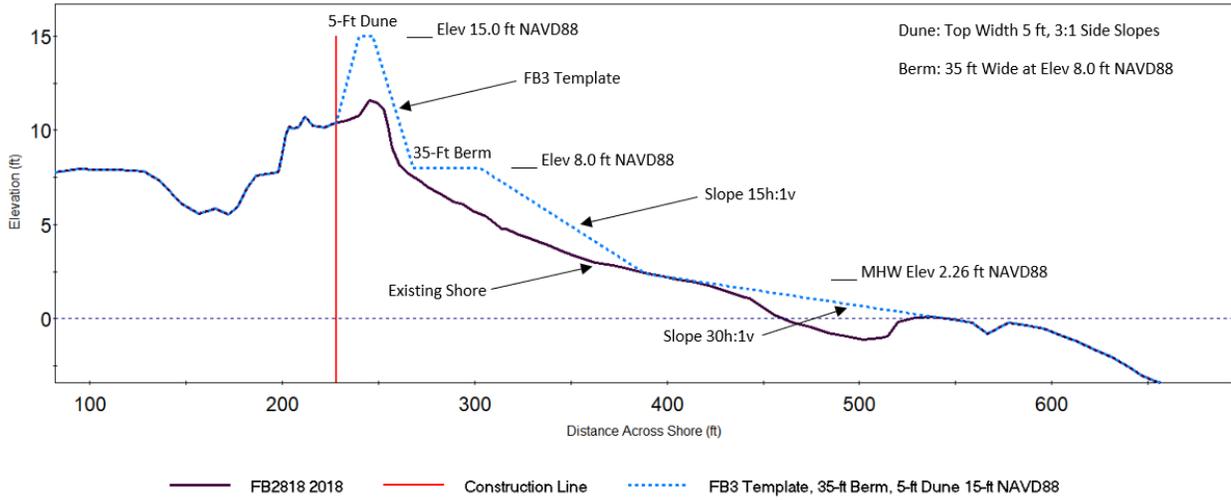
Typical Profile Southwest Segment Folly Beach
